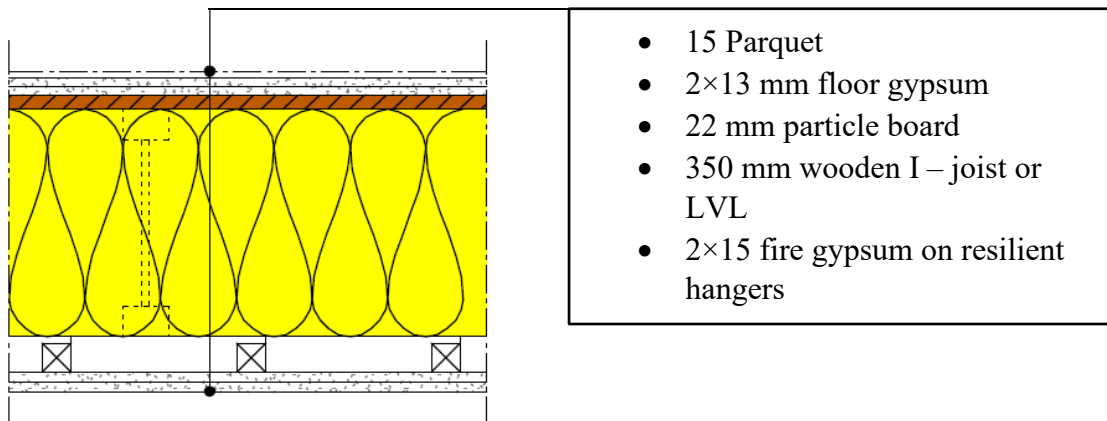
Floor structure 3 – Lightweight I-joint or LVL beam system.
